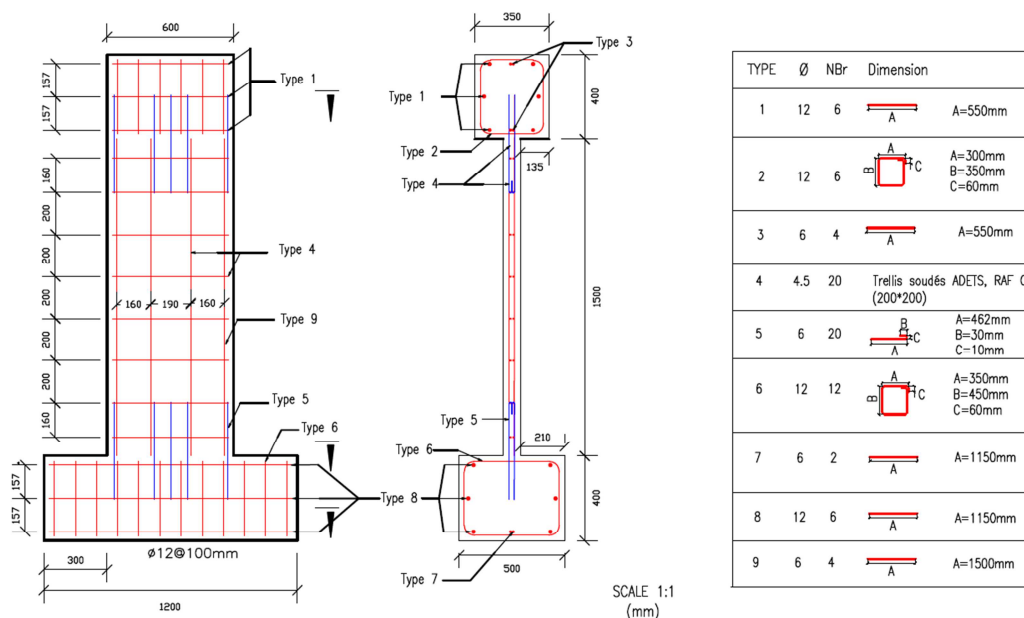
Reinforcement of the slender walls (VE1 and VER1)
